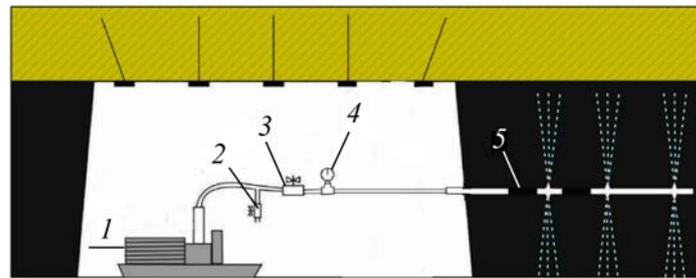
Equipment configuration: 1—high pressure pump; 2—dump valve; 3—high-pressure screw-valve; 4—manometer; 5—hydraulic fracturing tool.
